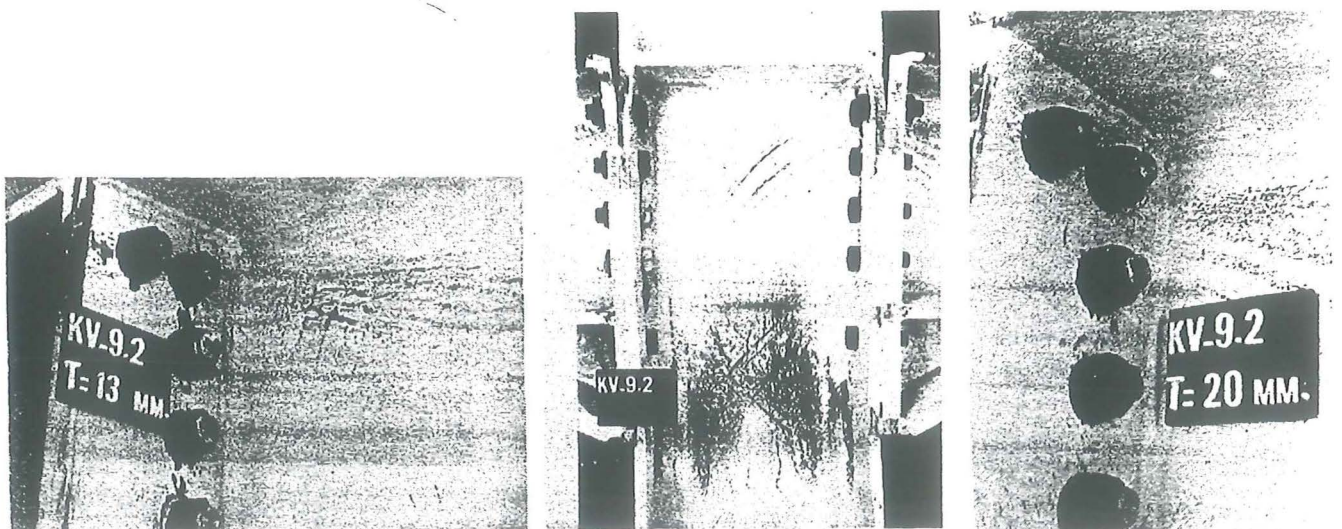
The 13mm-thick end-plate of test 2 failed whereas with the 20mm thick end-plate failure occurred due to bending of the column-flange.
